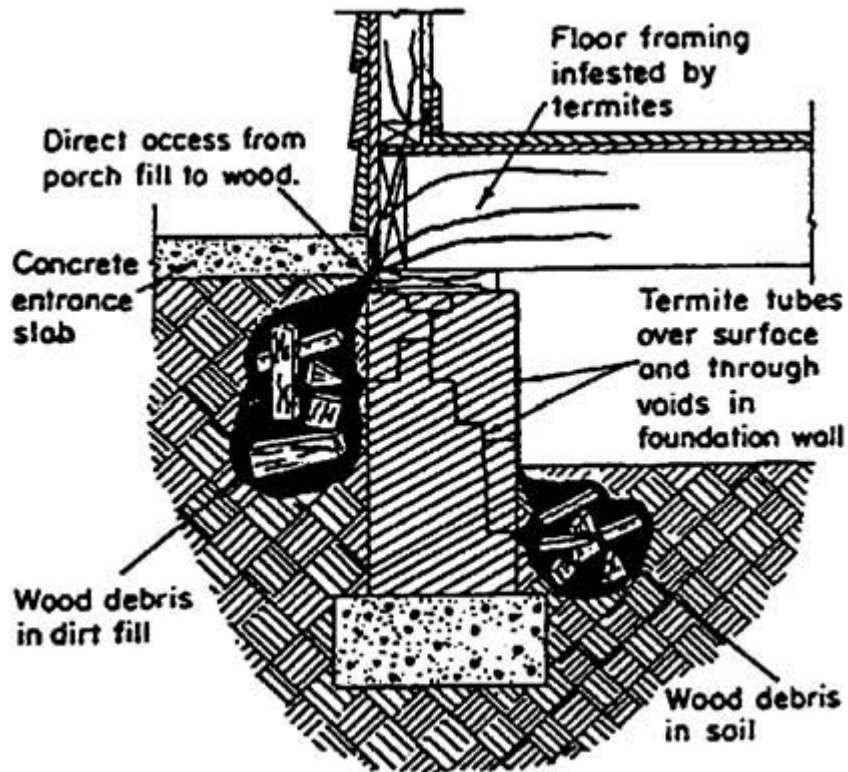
Termite colonies can develop in wood debris and soil and gain entrance into a building, particularly at the concrete entrance slabs of porches.
